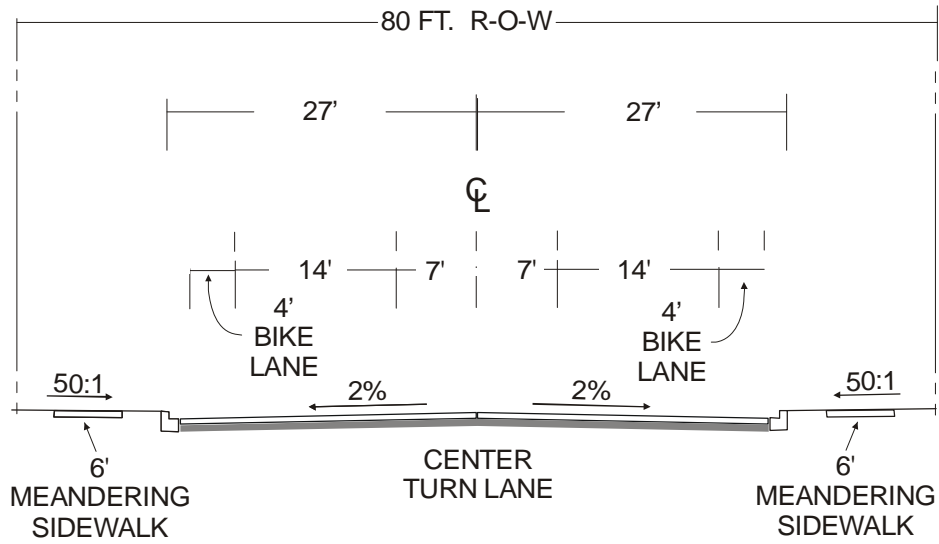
A. COLLECTOR ROADWAY CROSS-SECTION WITH CENTER TURN LANE
